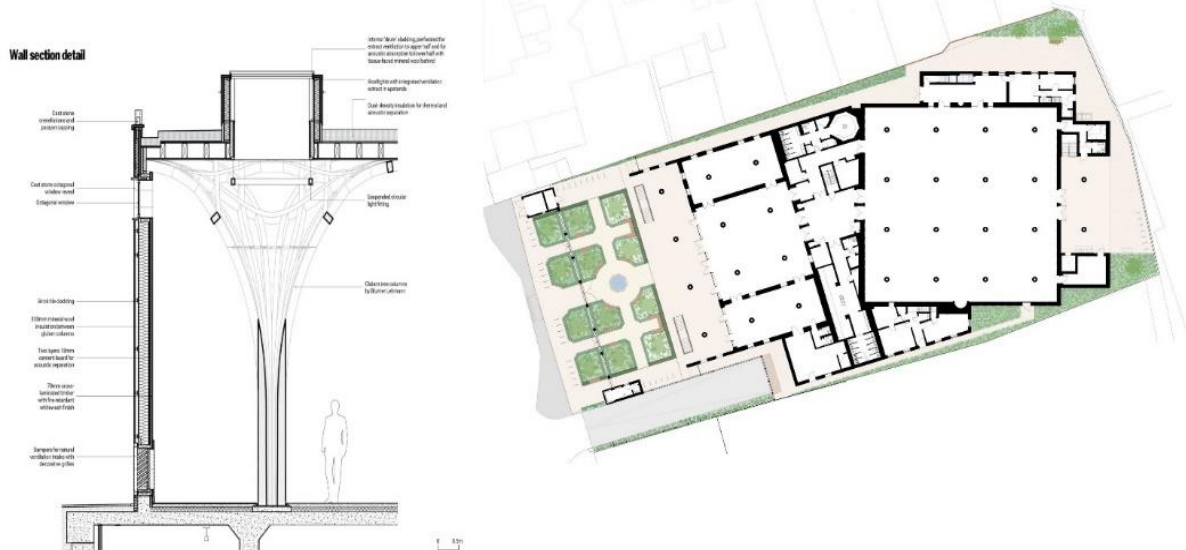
Wall section Details and Ground Floor plan. Source: "https://www.dezeen.com/2021/01/20/cambridge-central-mosque-marks-barfield-architects."
